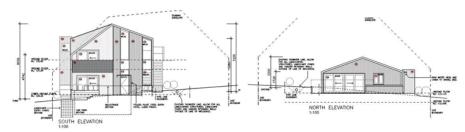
Front (South) and Rear (North) elevations of main dwelling (Steven Spizick Architect, 2021)
